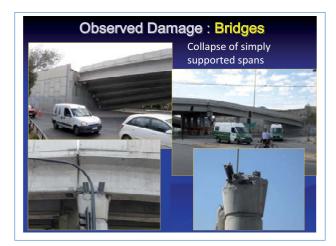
Bridge failure due to weak anchoring and lack of lateral support
